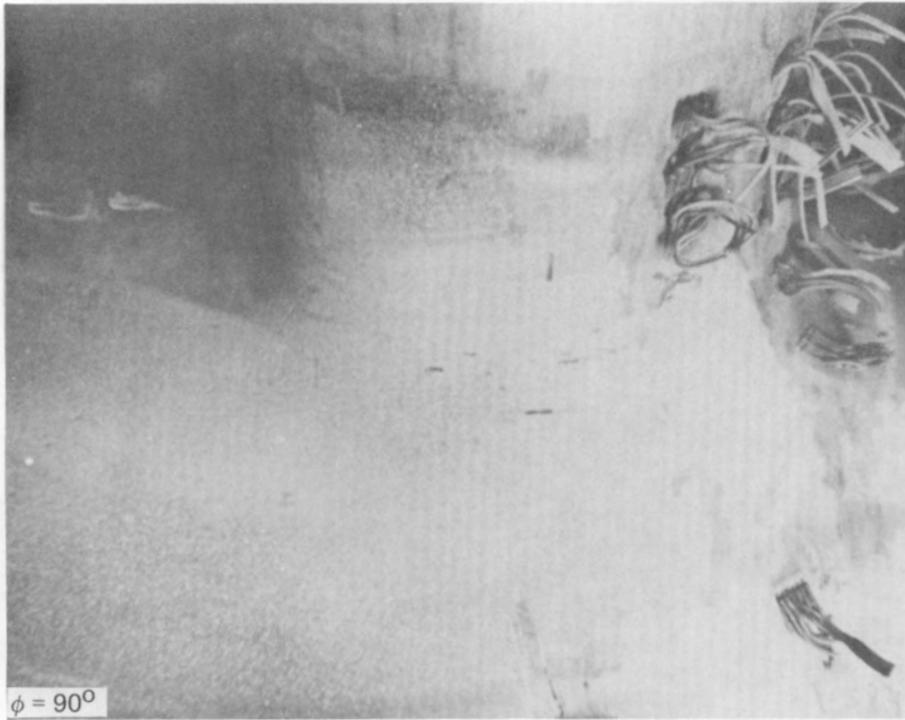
Fatigue cracks in T-8 after 3763 cycles.
